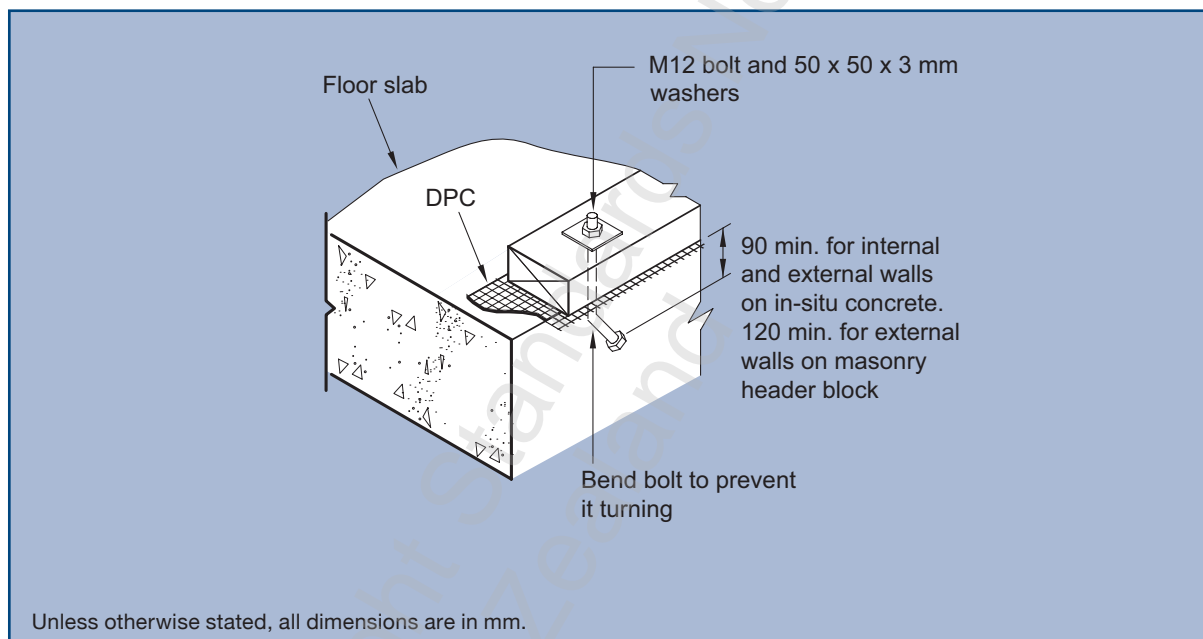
Fixing of bottom plates to slabs and cast-in anchors (see 7.5.12.1)
